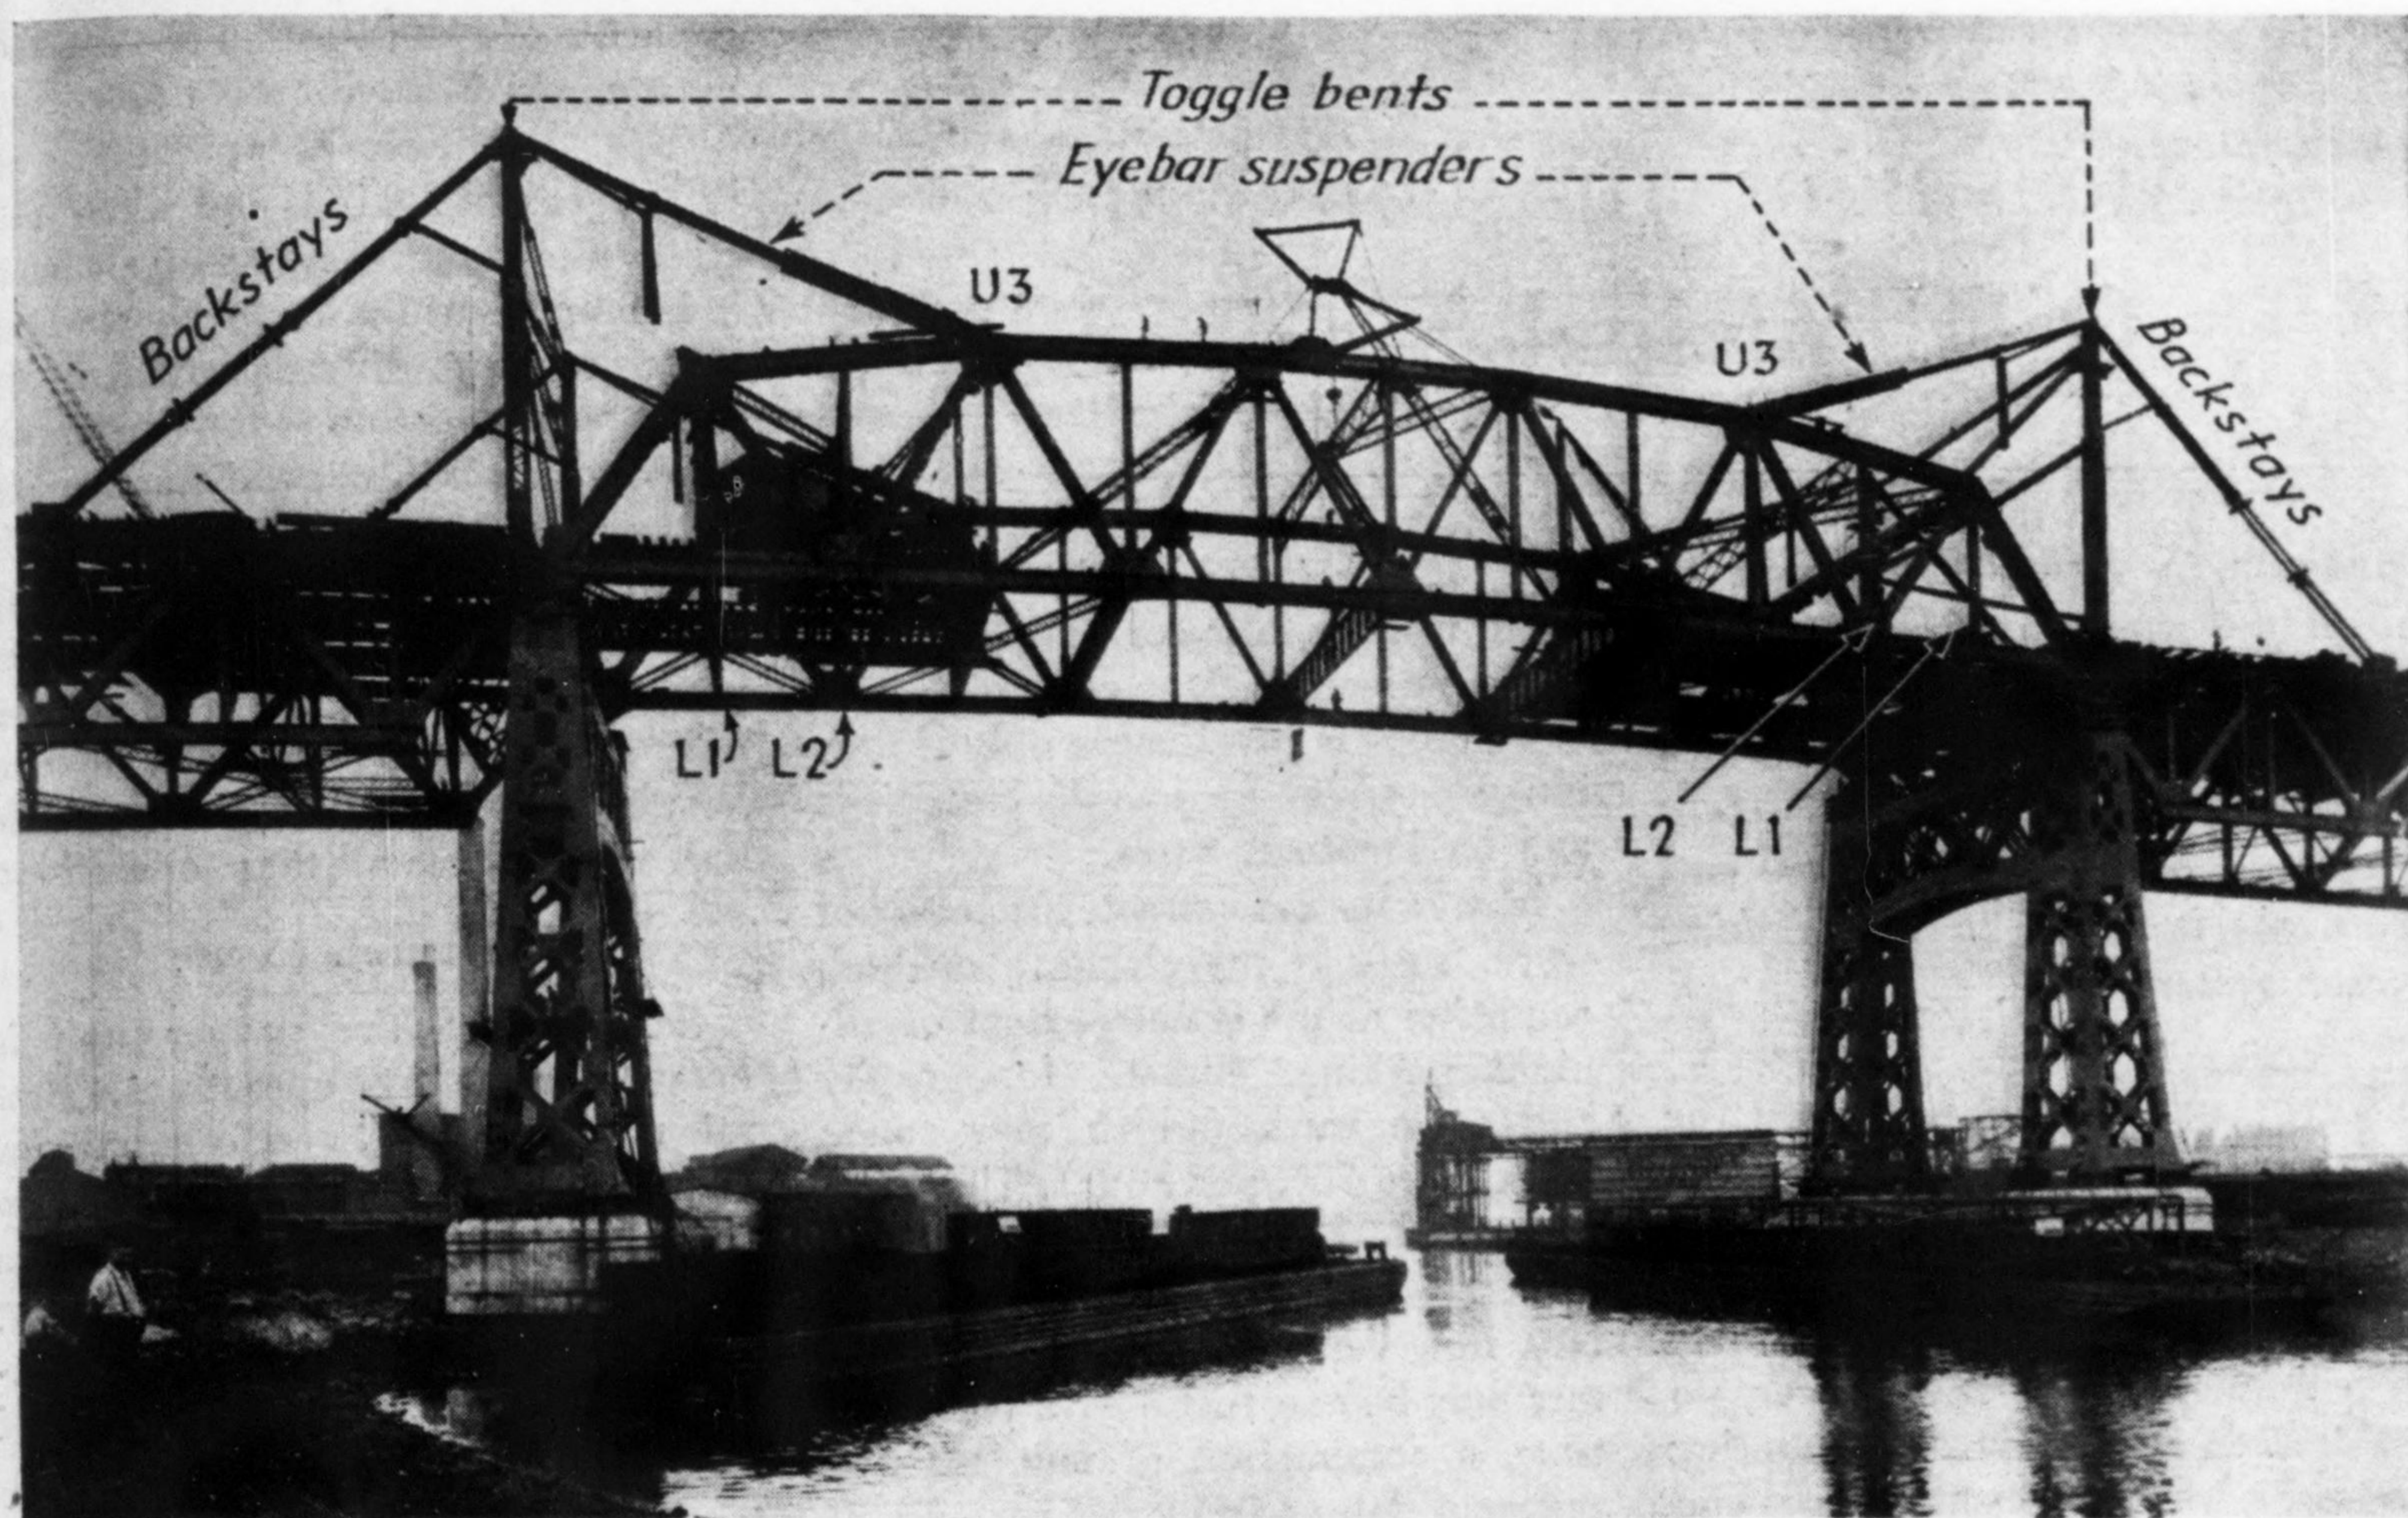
Using tiebacks to counterweight approach spans the channel span was erected as a cantilever 125 ft. high over an unimpeded waterway.
